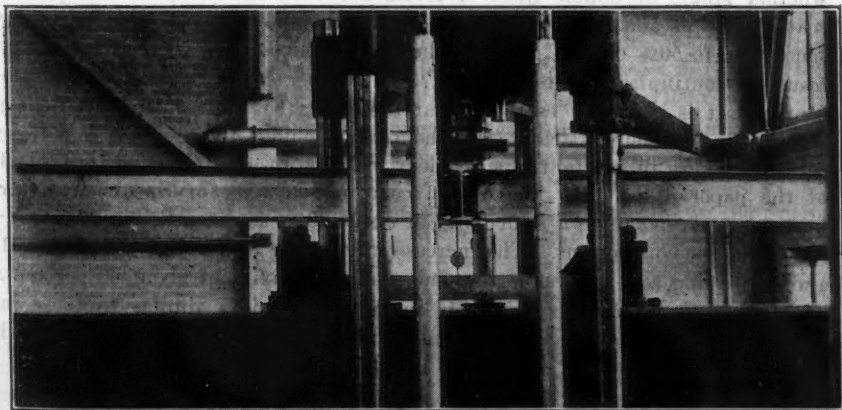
BEAM TEST OF SPECIMEN 4 ON 48-INCH SPAN.
